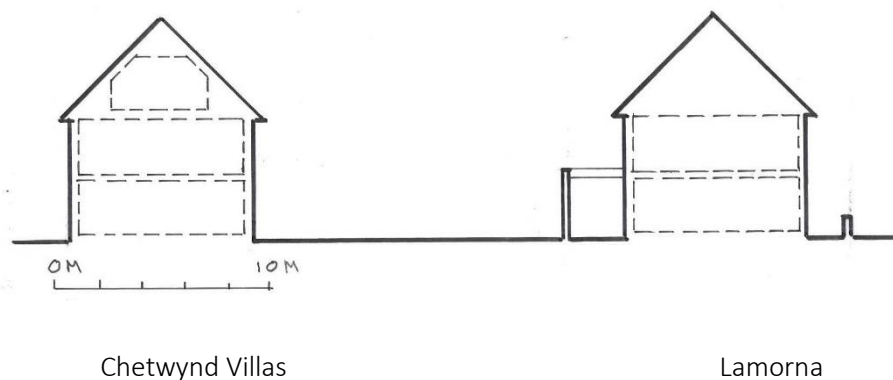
Section through the existing Lamorna on Dartmouth Park Road and Chetwynd Villas on Chetwynd Road.
